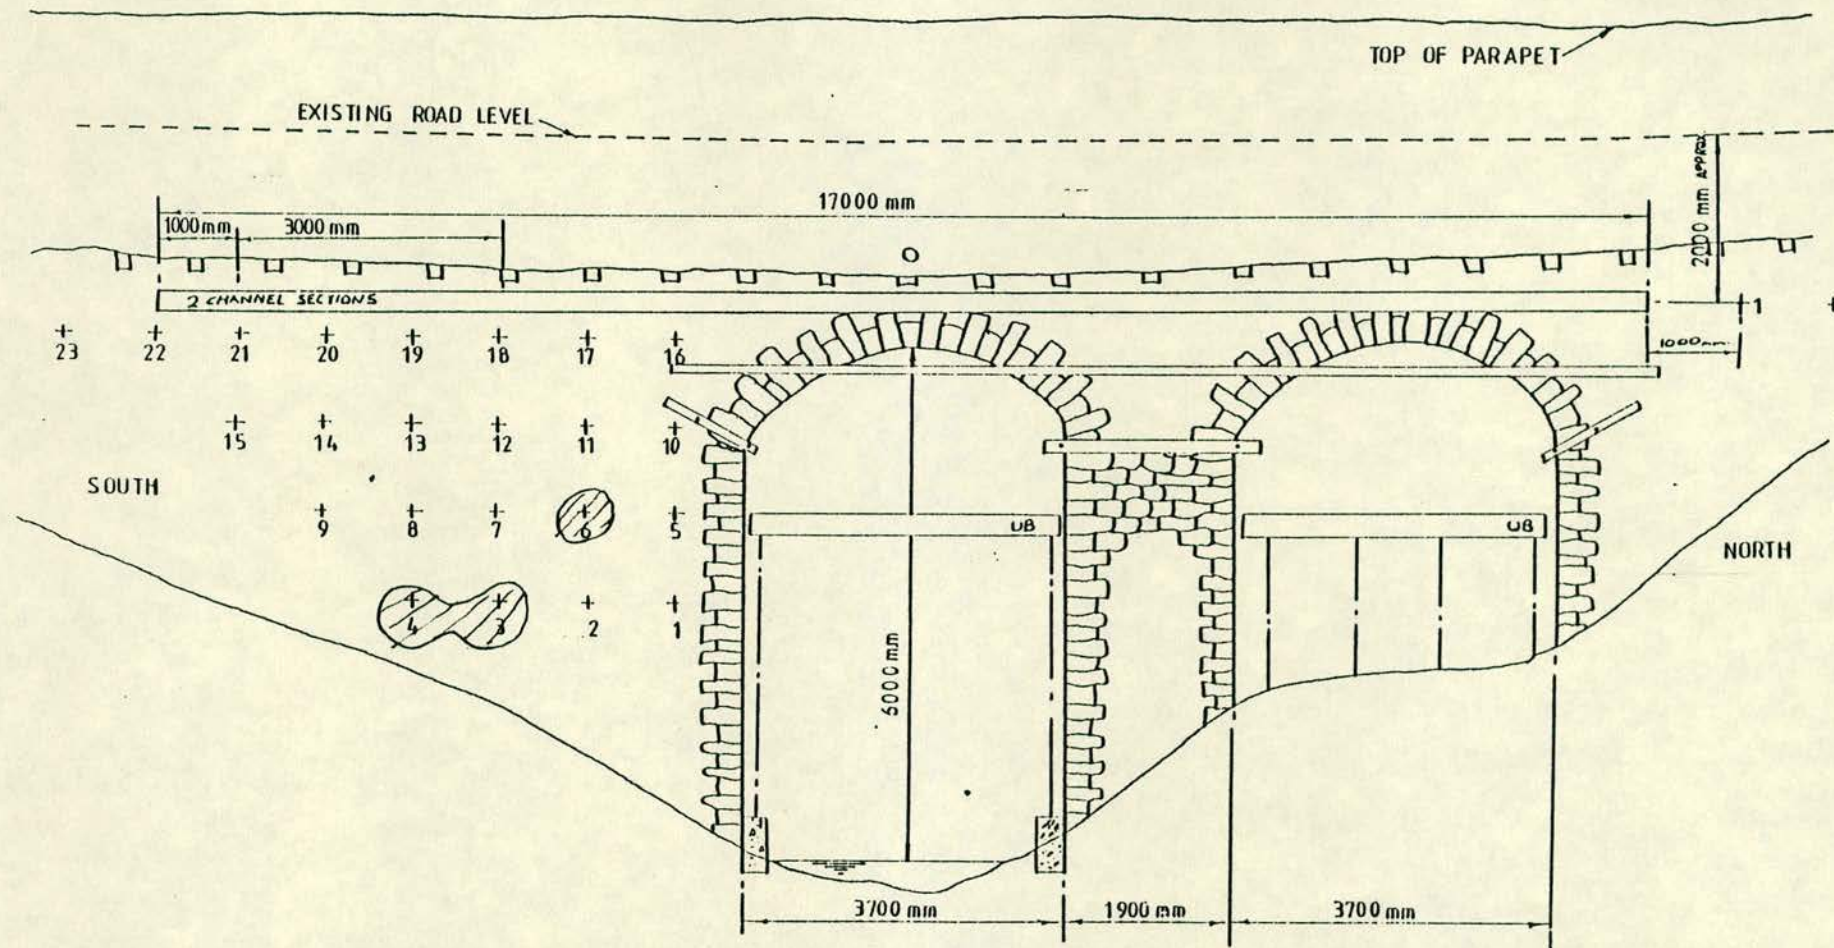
Middleton North Burn Bridge, downstream elevation, suspected void area (shaded) after grouting
